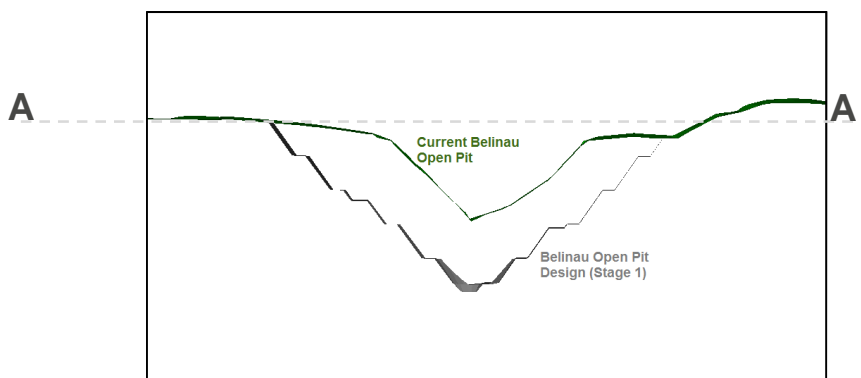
Existing & designed Belinau pits (section – looking north-east)
